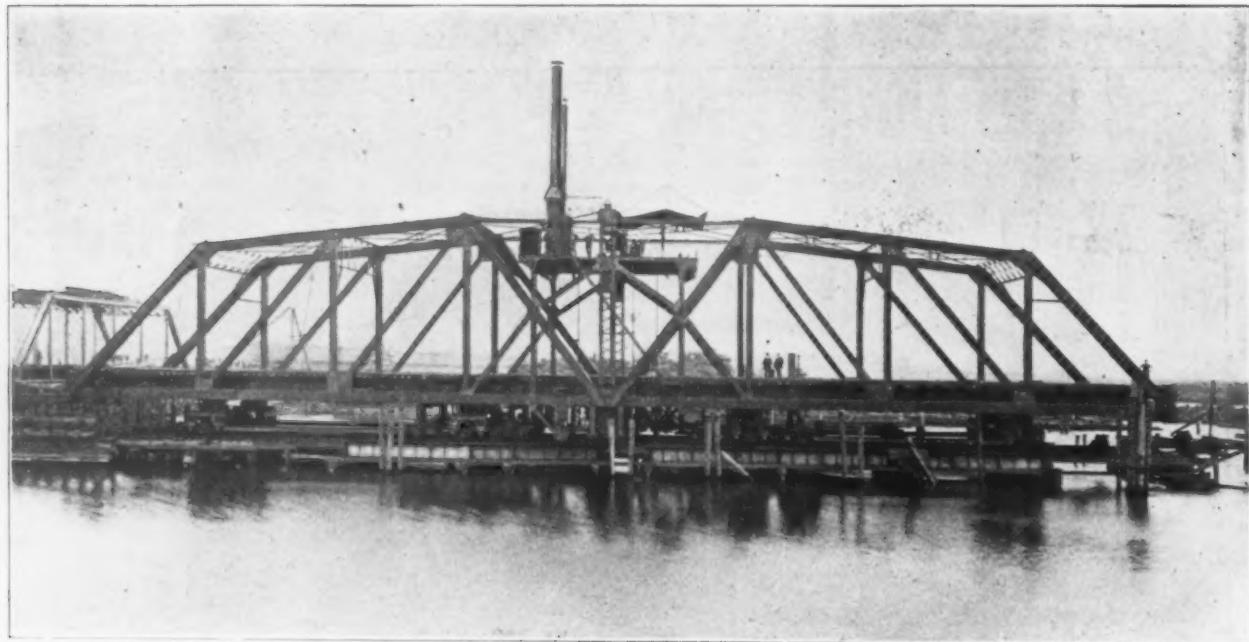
New Drawbridge, Showing Trucks upon which it was Mounted.
